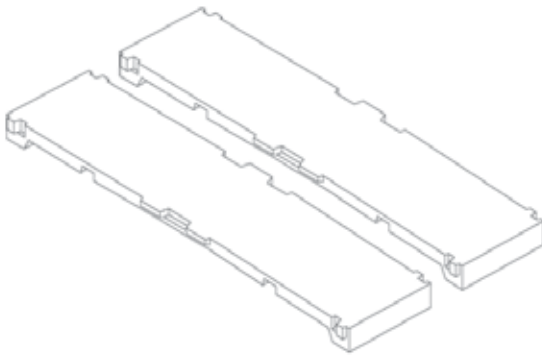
3D-sketch of two elements, illustrating the joint. Figure 2 – Element during assembly
